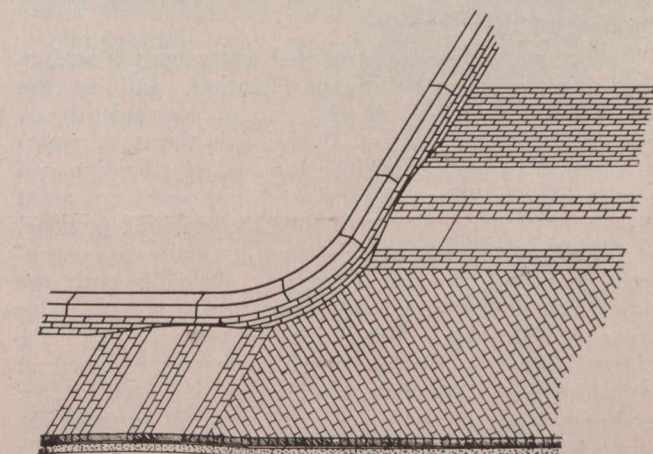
View Showing Setting of Bridge Stones at Street Corners.
